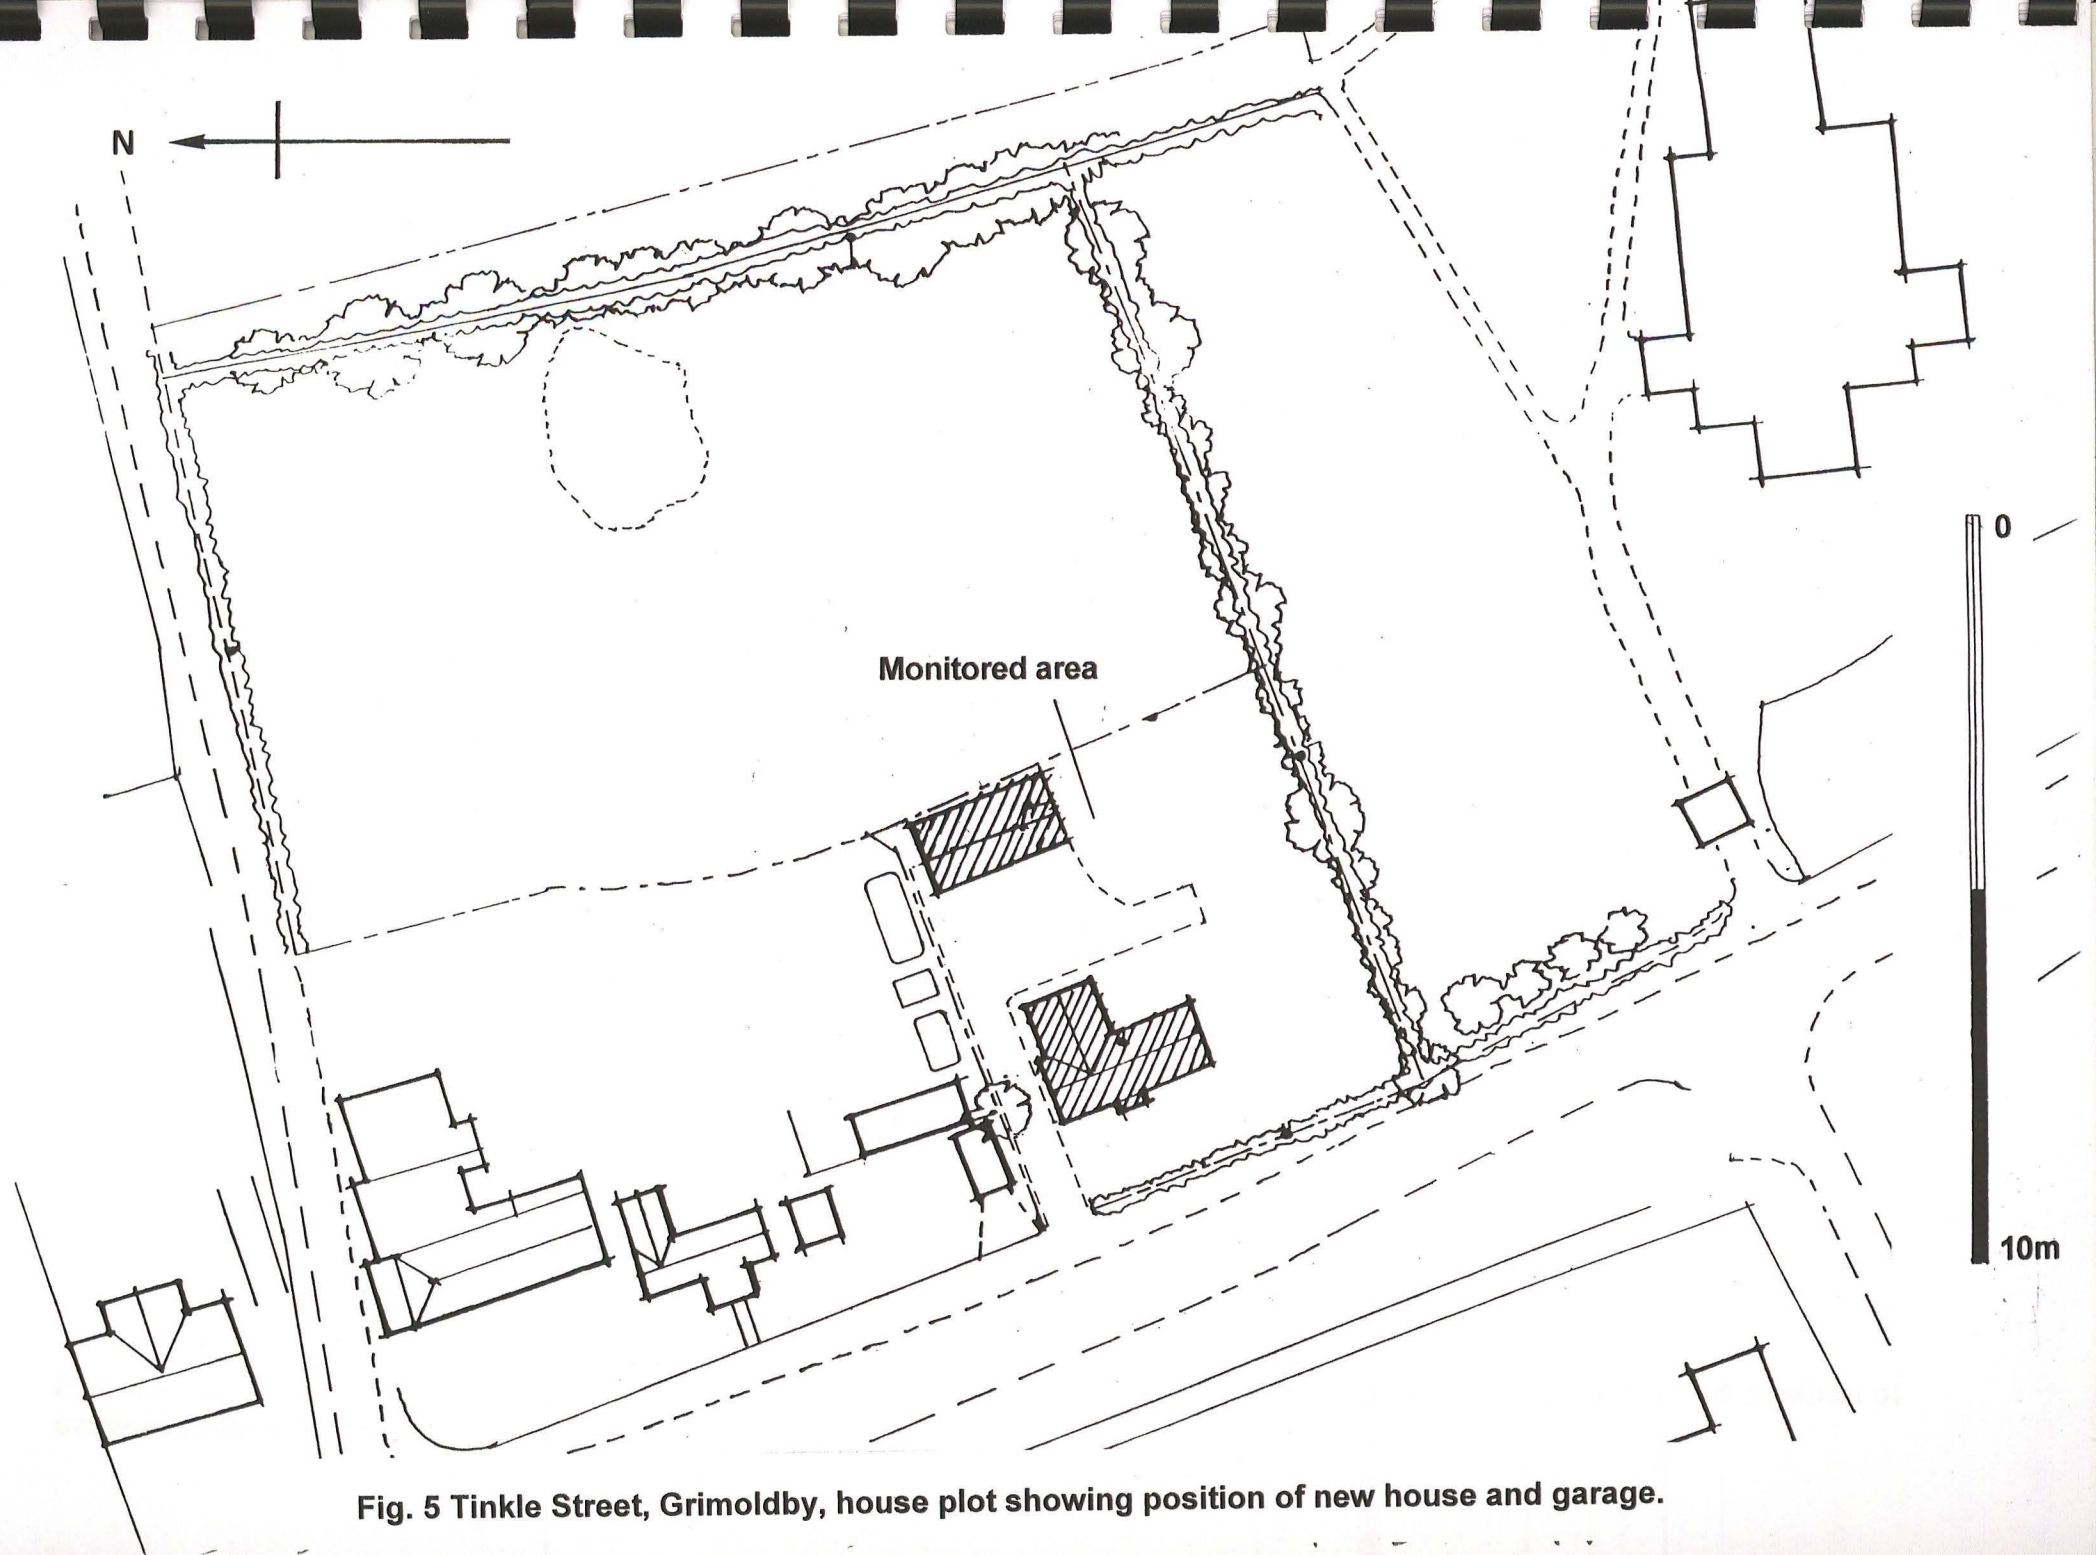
Tinkle Street, Grimoldby, house plot showing position of new house and garage.
